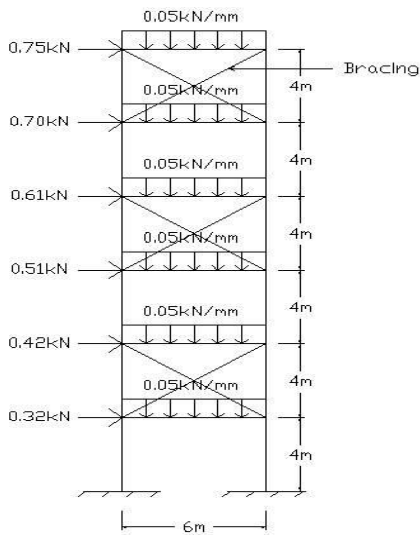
Analytical model for Case 5 : Steel frame structure with alternate bracing system
